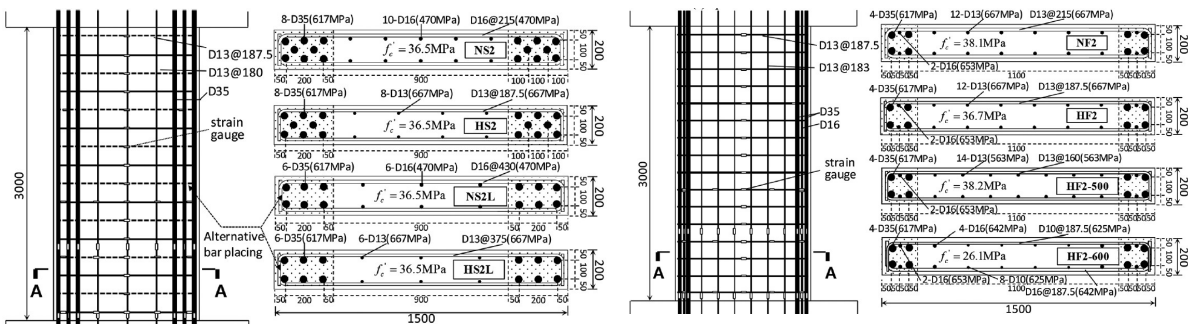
Reinforcement details of walls tested by Baek et al. (2017)
